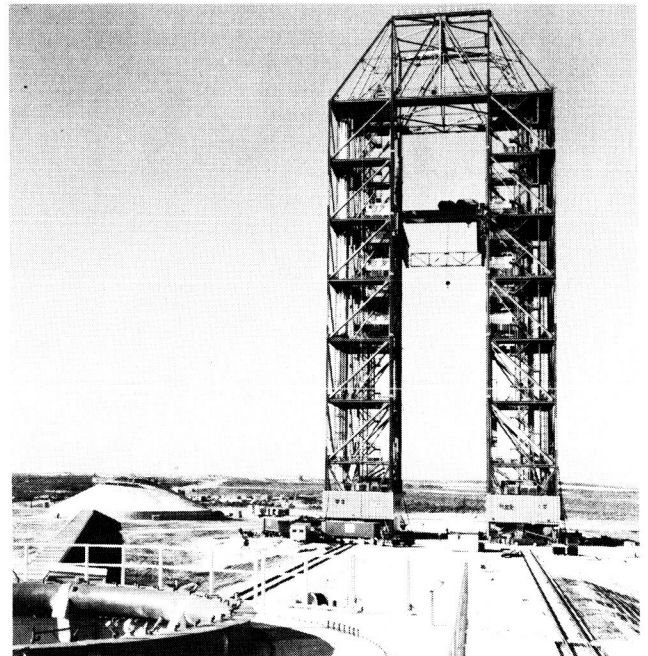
FACILITIES CONSTRUCTION AT LAUNCH COMPLEX 34
